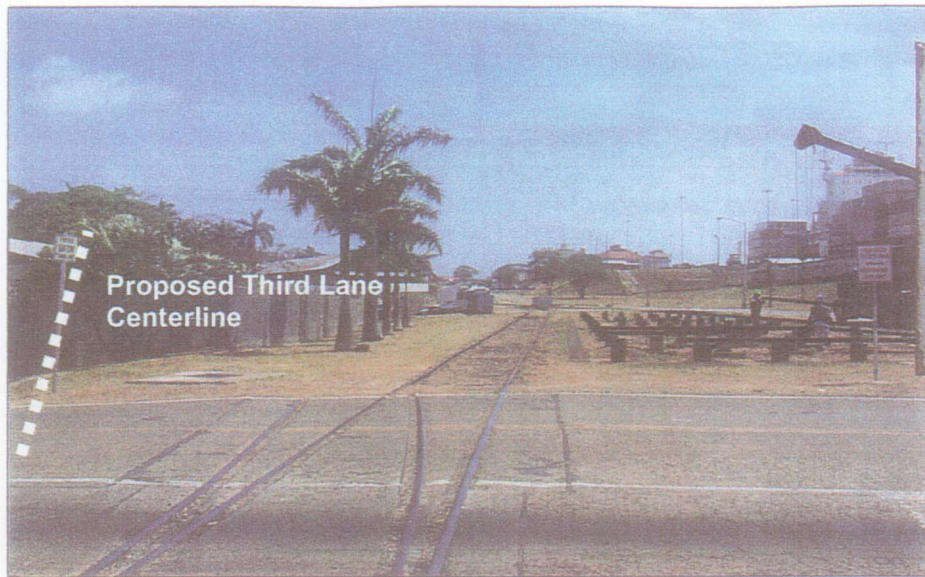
Access Road Entering Lower (North) End Of Gatun Locks
